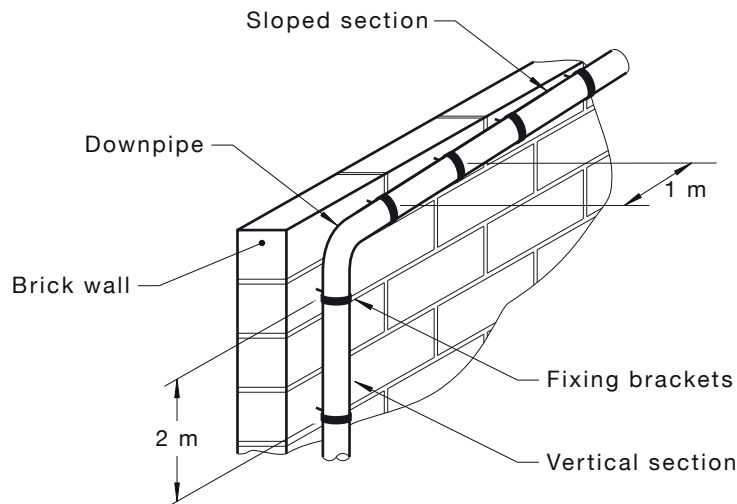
DOWNPIPE FASTENINGS
